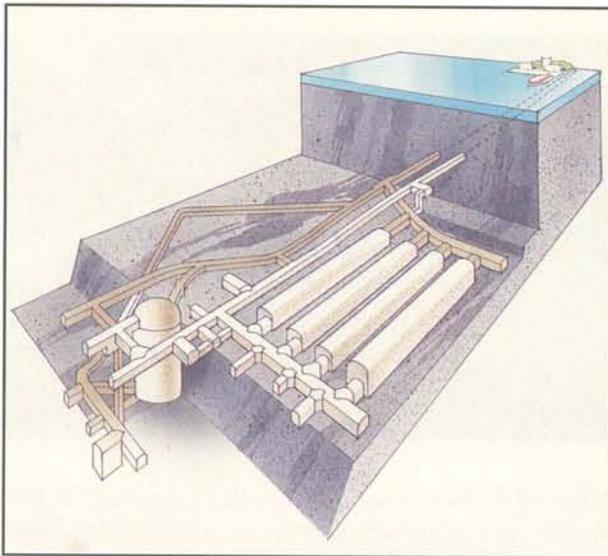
Overview of tunnels and storage chambers in the first construction stage of SFR.
